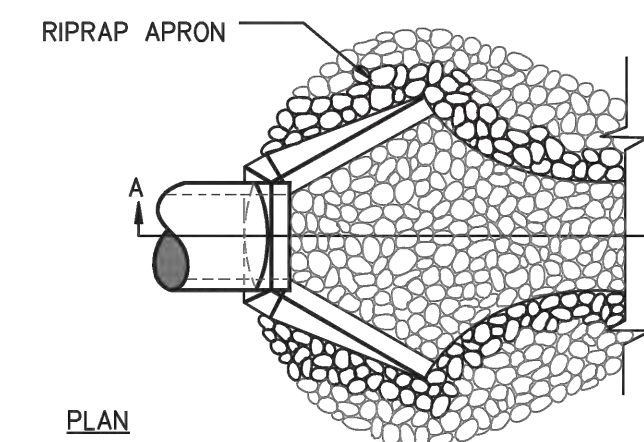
Riprap Outlet Protection (Modified From Va SWCC)
